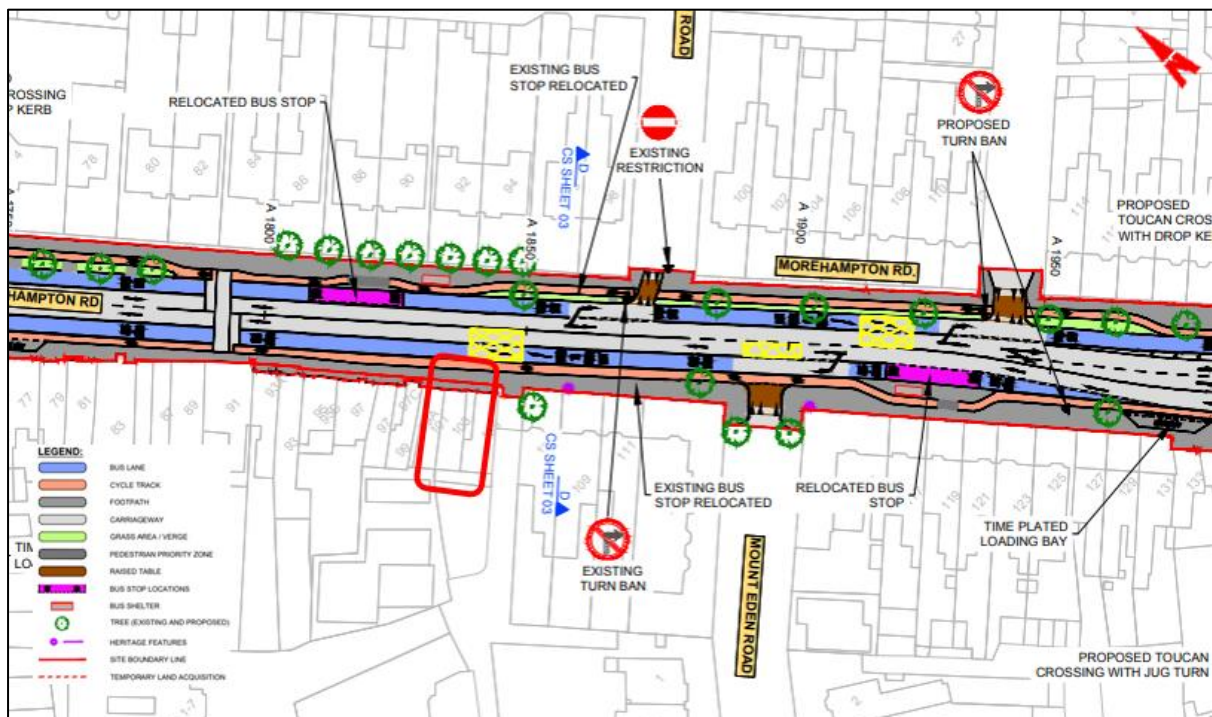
Extract from General Arrangement Drawing at Morehampton Road (Sheet 06)
